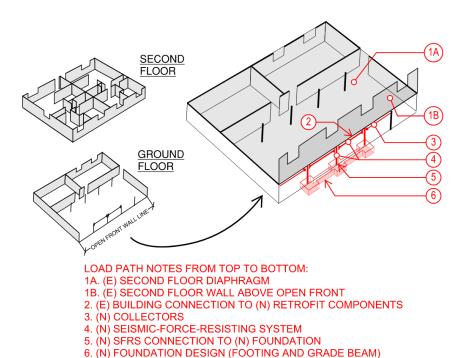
Typical load path of a new seismic-force-resisting system along the open front of a SWOF building.
